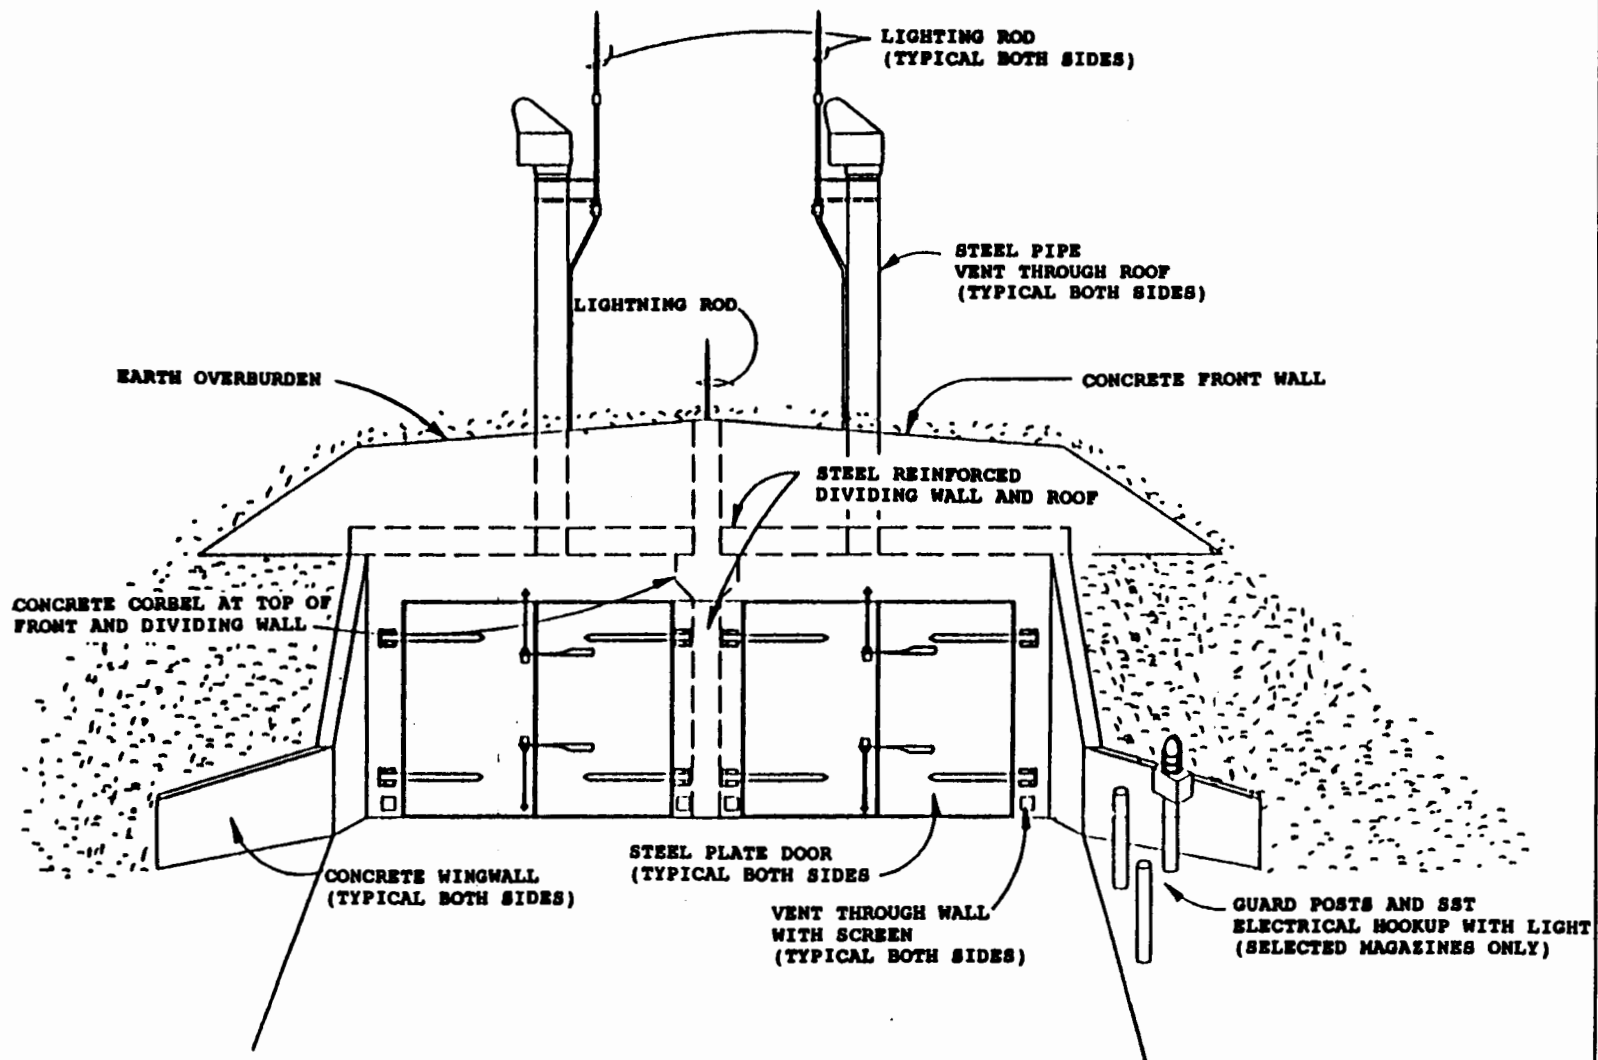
Modified-Richmond Magazine Layout (Front View)
